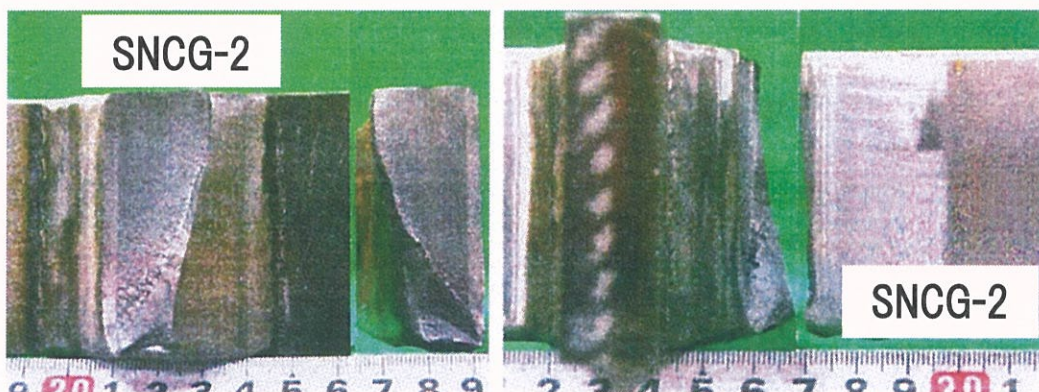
13 Fracture surface and pass after fatigue test
